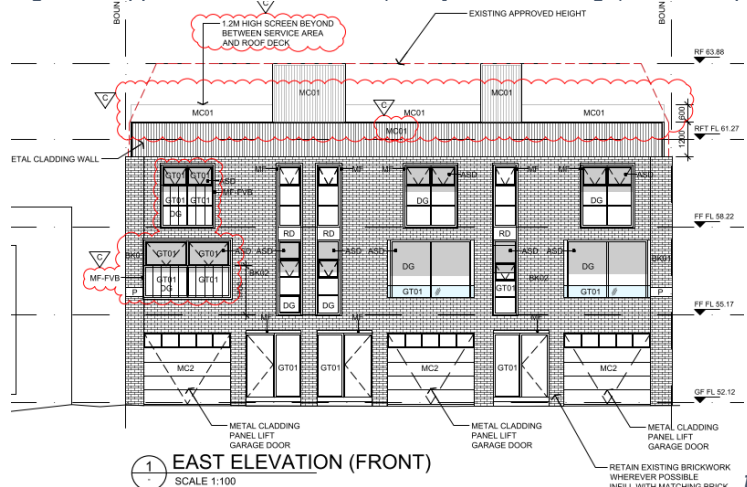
Proposed East Elevation (Hardy Street frontage) of Development
